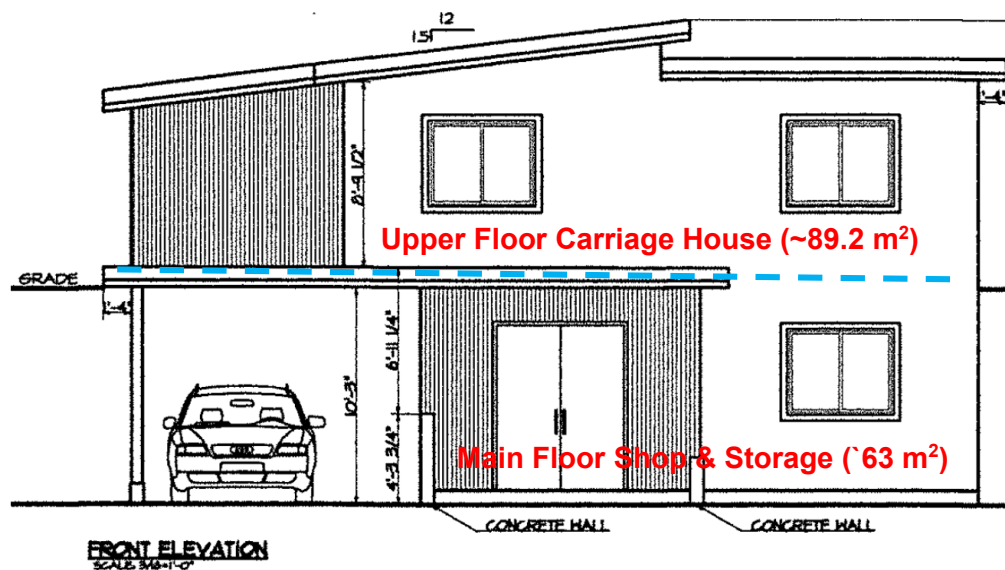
Proposed Carriage Roof to be Higher than the Peak of the Roof of the Principle Dwelling
